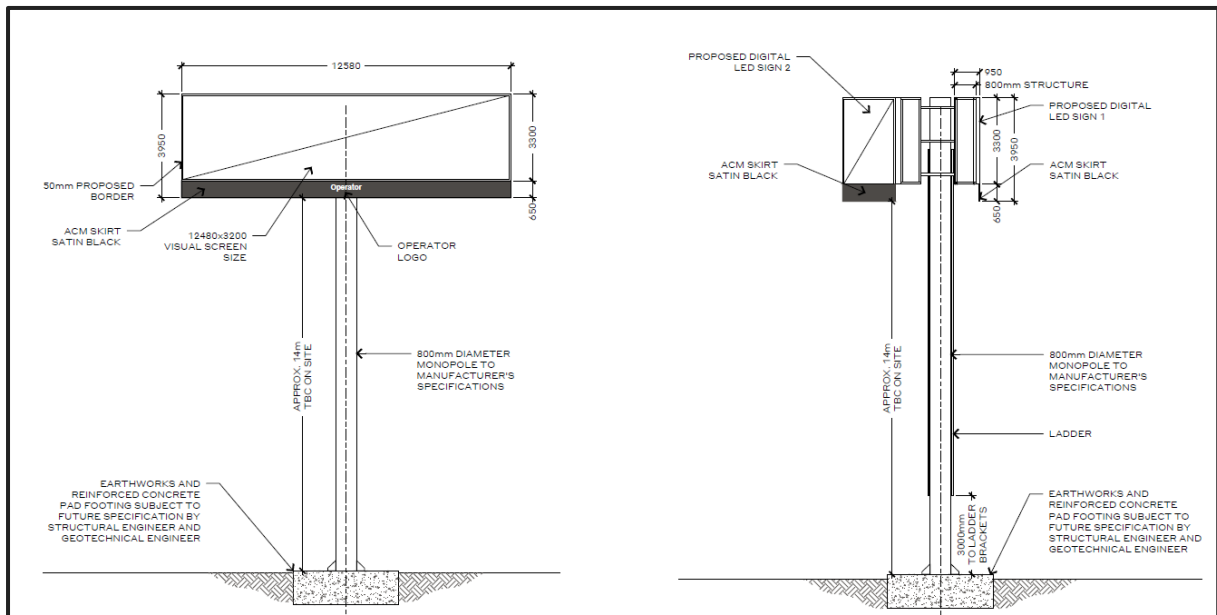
| Typical front elevation and section (Source: Applicant's FRtS)
